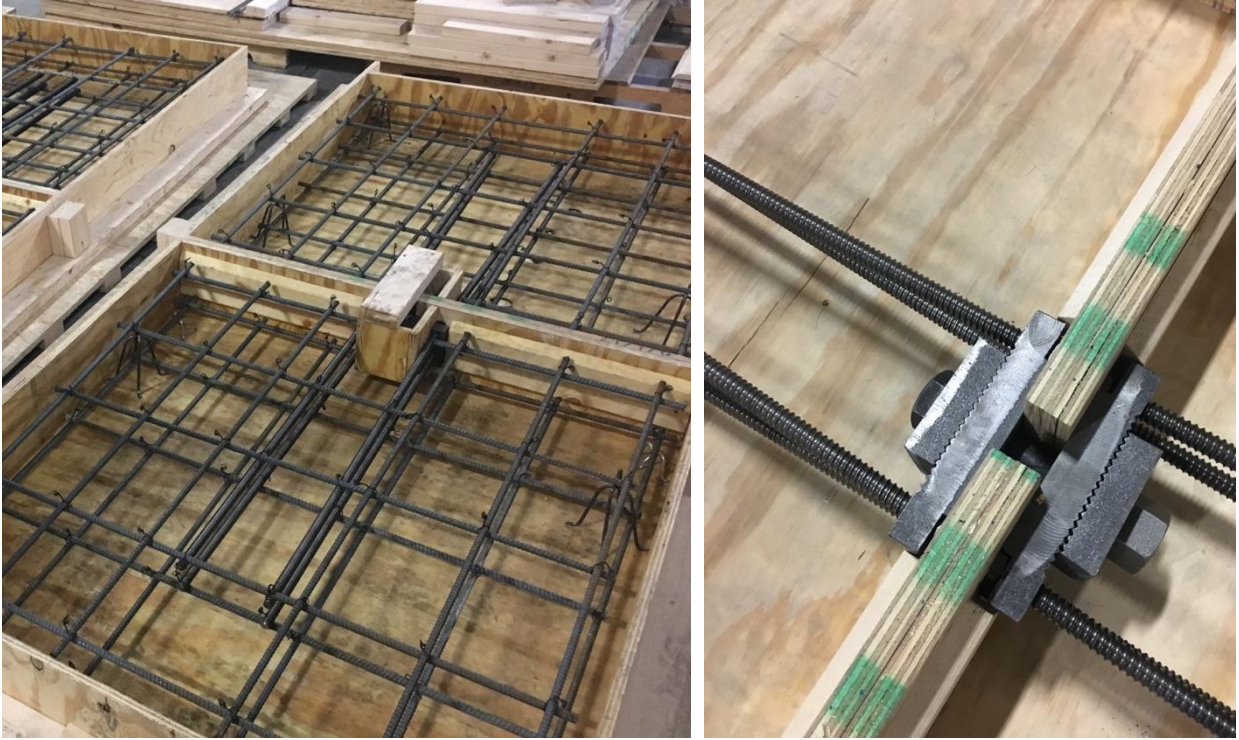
Formwork for Mechanical Connection Slab Panels
